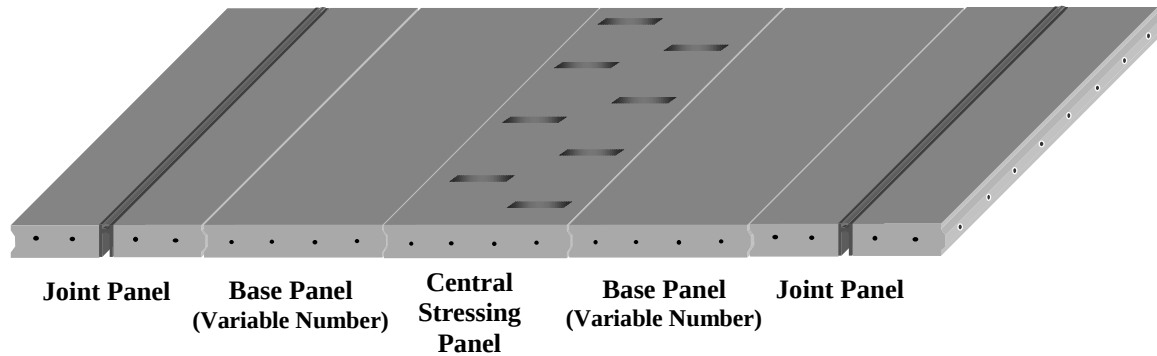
Typical precast pavement panel assembly⁽³⁾.
